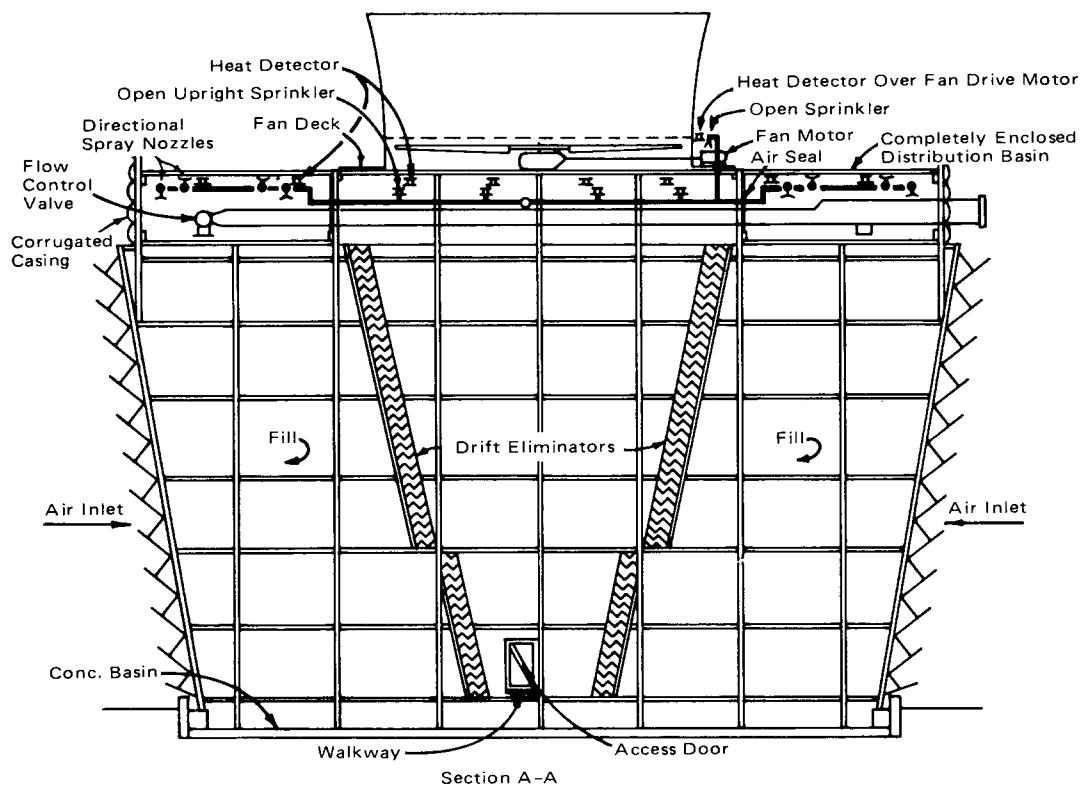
(b) Typical deluge fire protection arrangement for crossflow towers with completely enclosed distribution basins.
